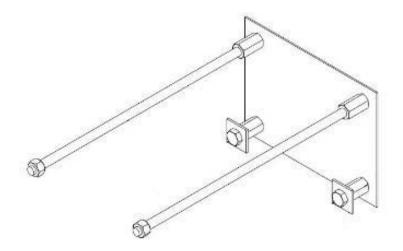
Proposed Deck Anchorage Plate with Embedded Hardware
